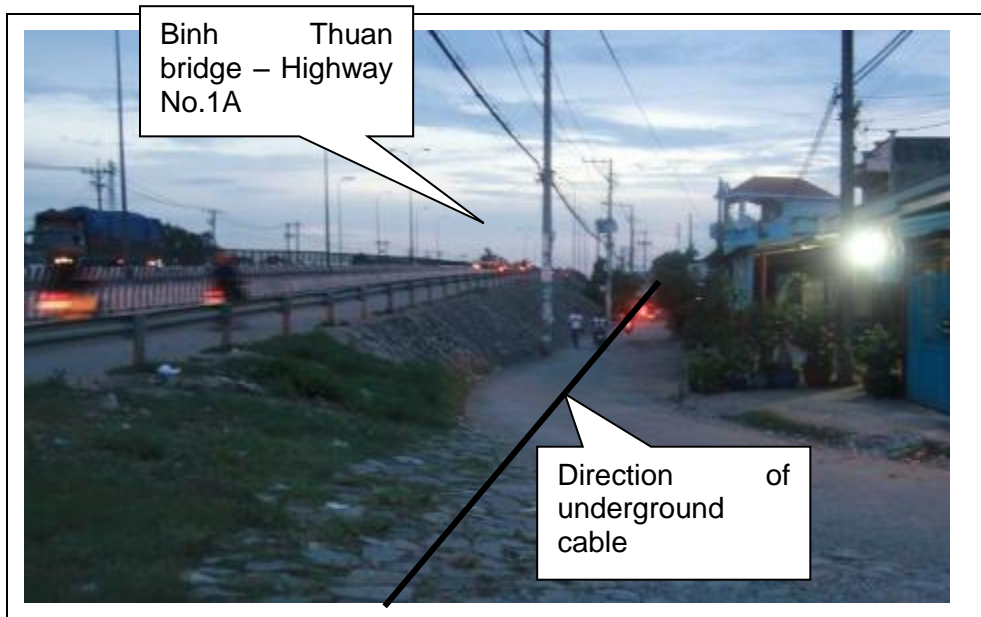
Direction of underground cable on the bypass road running parallel with and lower than Binh Thuan bridge on Highway No.1A
